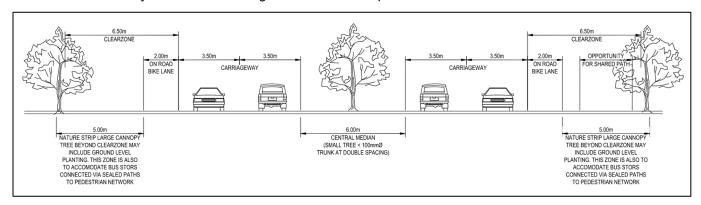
Ultimate cross section design applicable to Tarletons Road and Paynes Road
